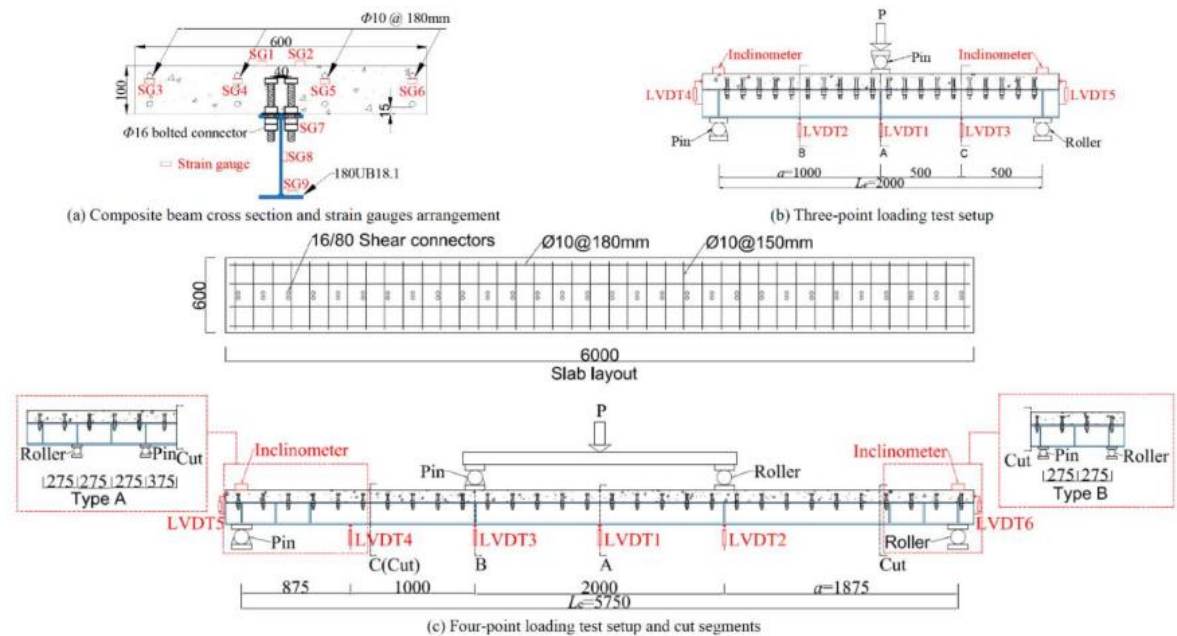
Configuration of geometry and instrument setup for stainless steel-concrete composite beam tests.
